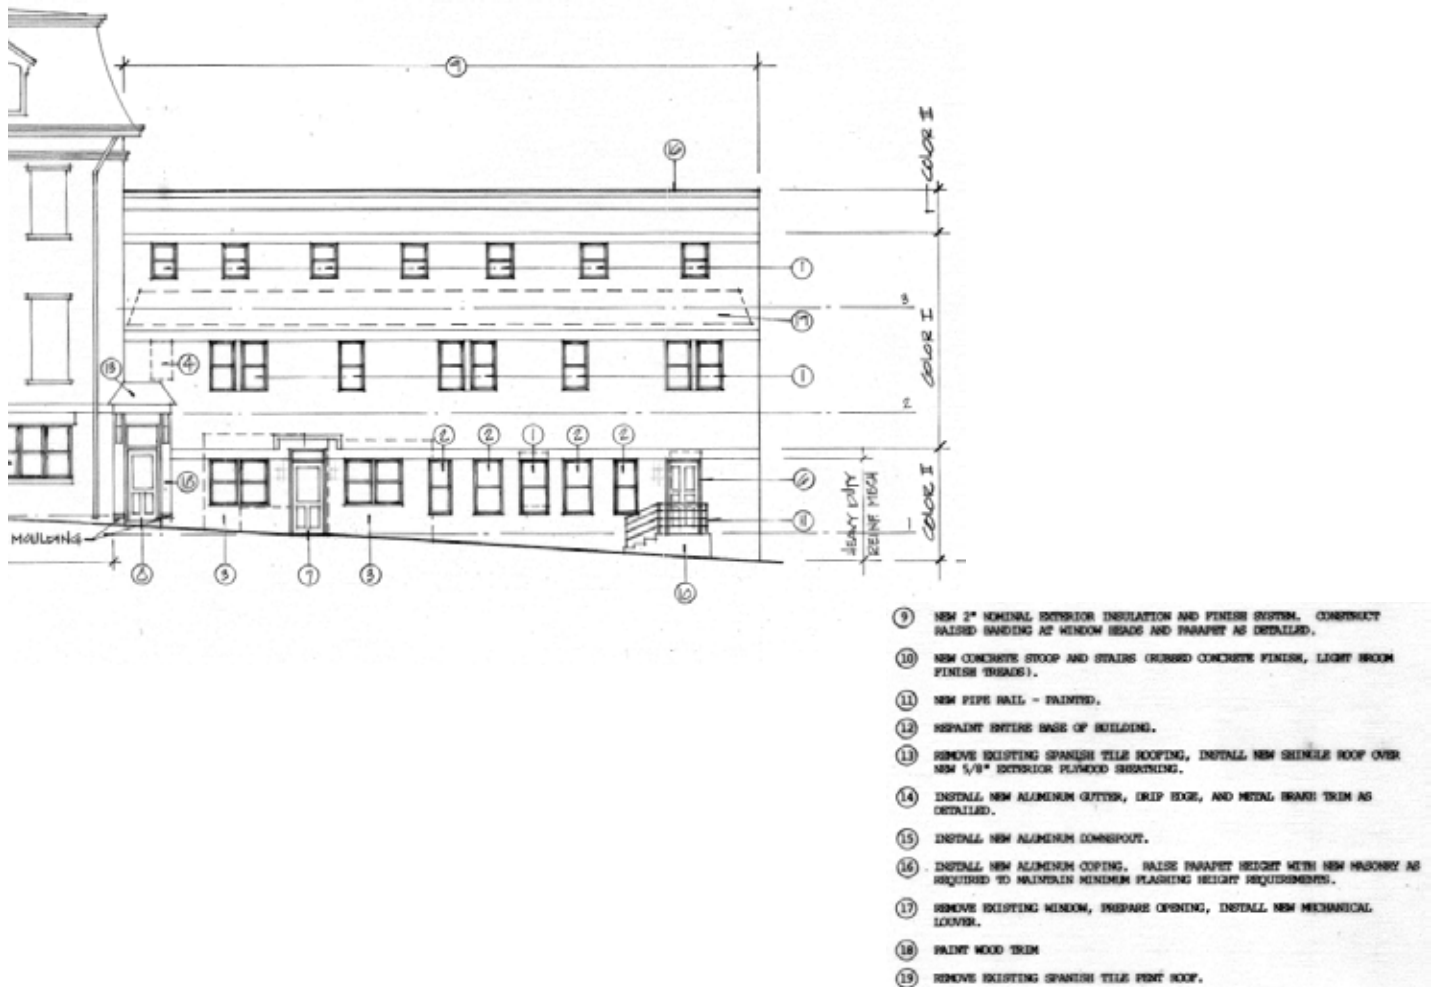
top, elevation, 1985; Image 31: right, elevation notes; Drawings and Notes by Spillman Farmer Architects, August 6, 1986
